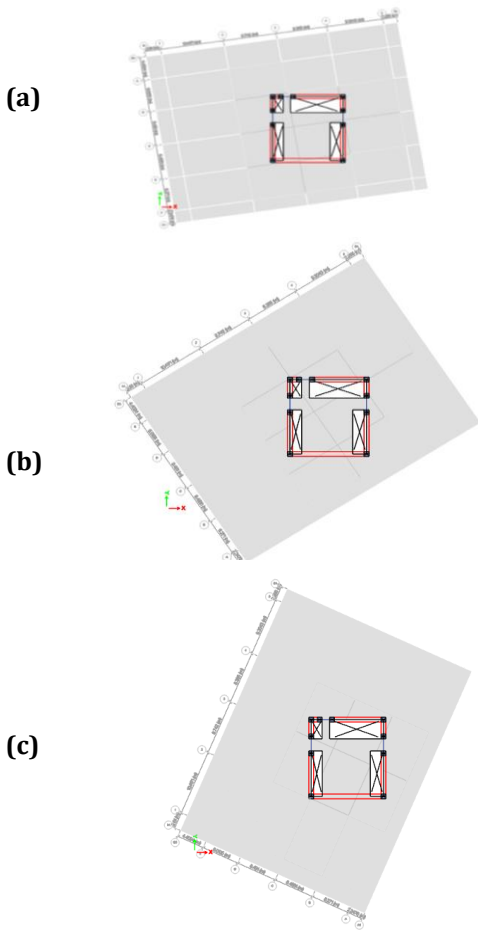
Plans of The Twisted Tall Building: (a) 3rd floor (9-degree rotation); (b) 11th floor (33-degree rotation); (c) 22nd floor (66-degree rotation)
